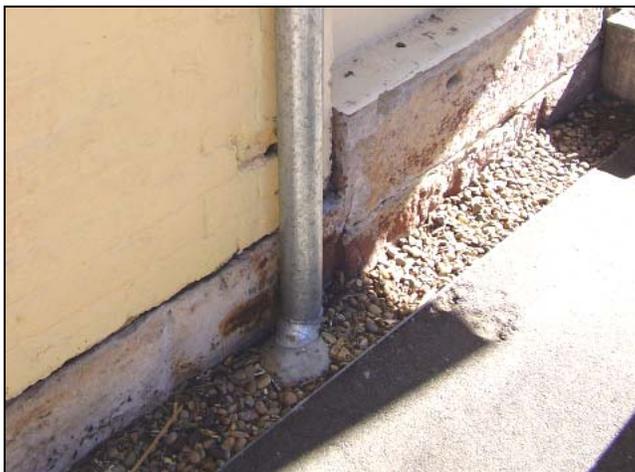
The hard paving in front of the buildings stops short of the sandstone base of the building and permeable fill provided to reduce moisture at the building footings. It is assumed that this was provided as part of the 1990s works. The gutters and downpipes also date from the 1990s works.
